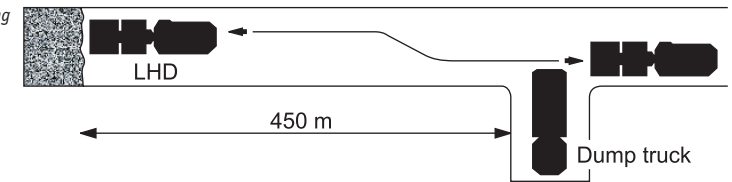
Loading in large tunnel without loading niches with one LHD-machine.
